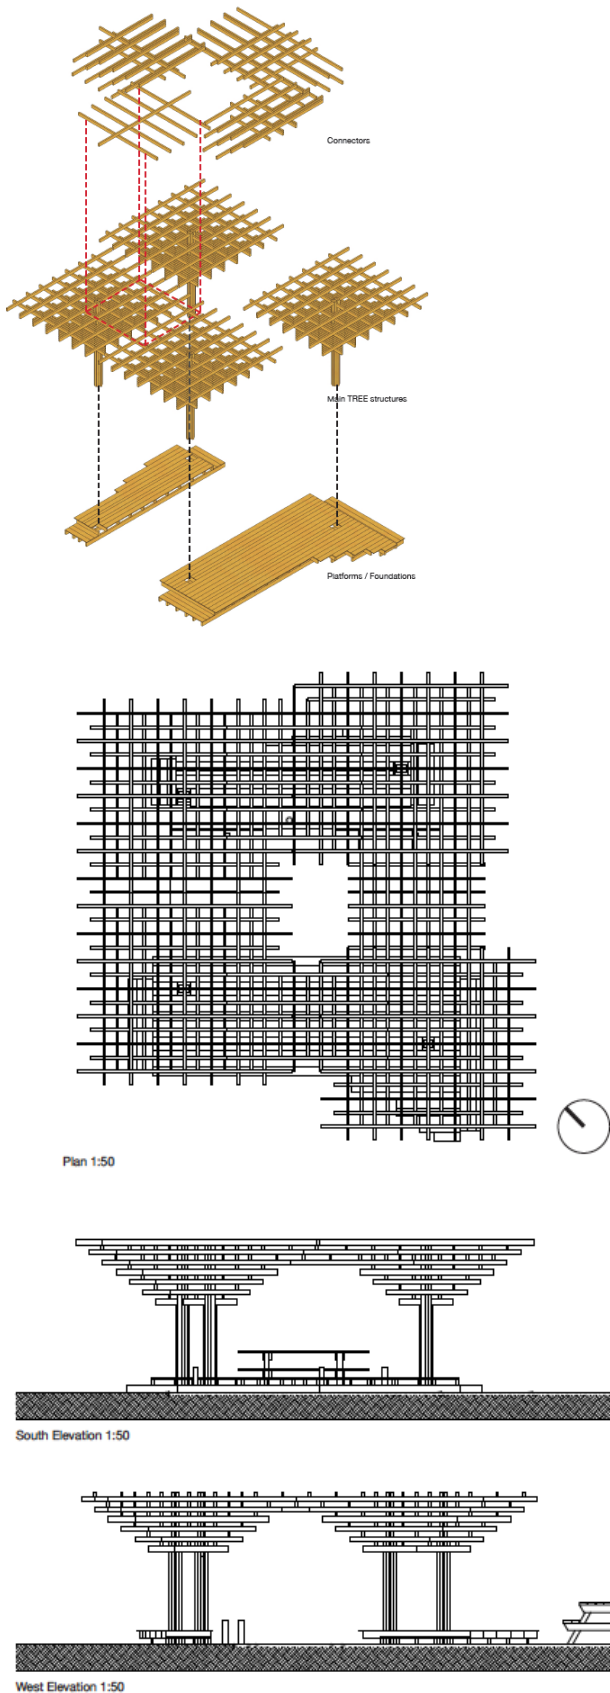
Exploded axonometric, roof plan and elevations of the winning scheme
